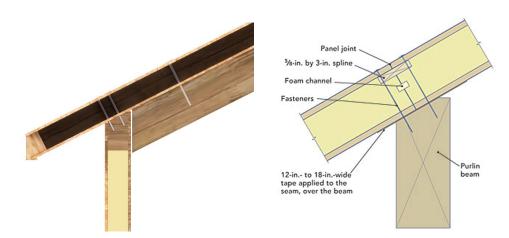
Roof SIPs and wall SIPs Connection (Self-drawn by the author)
